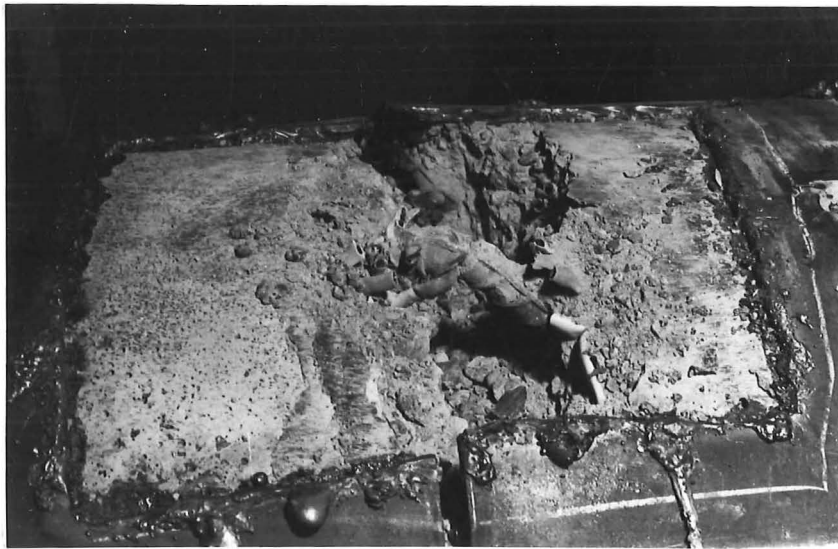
UNIT 6 (SPIRAL REINFORCEMENT R10-200)
